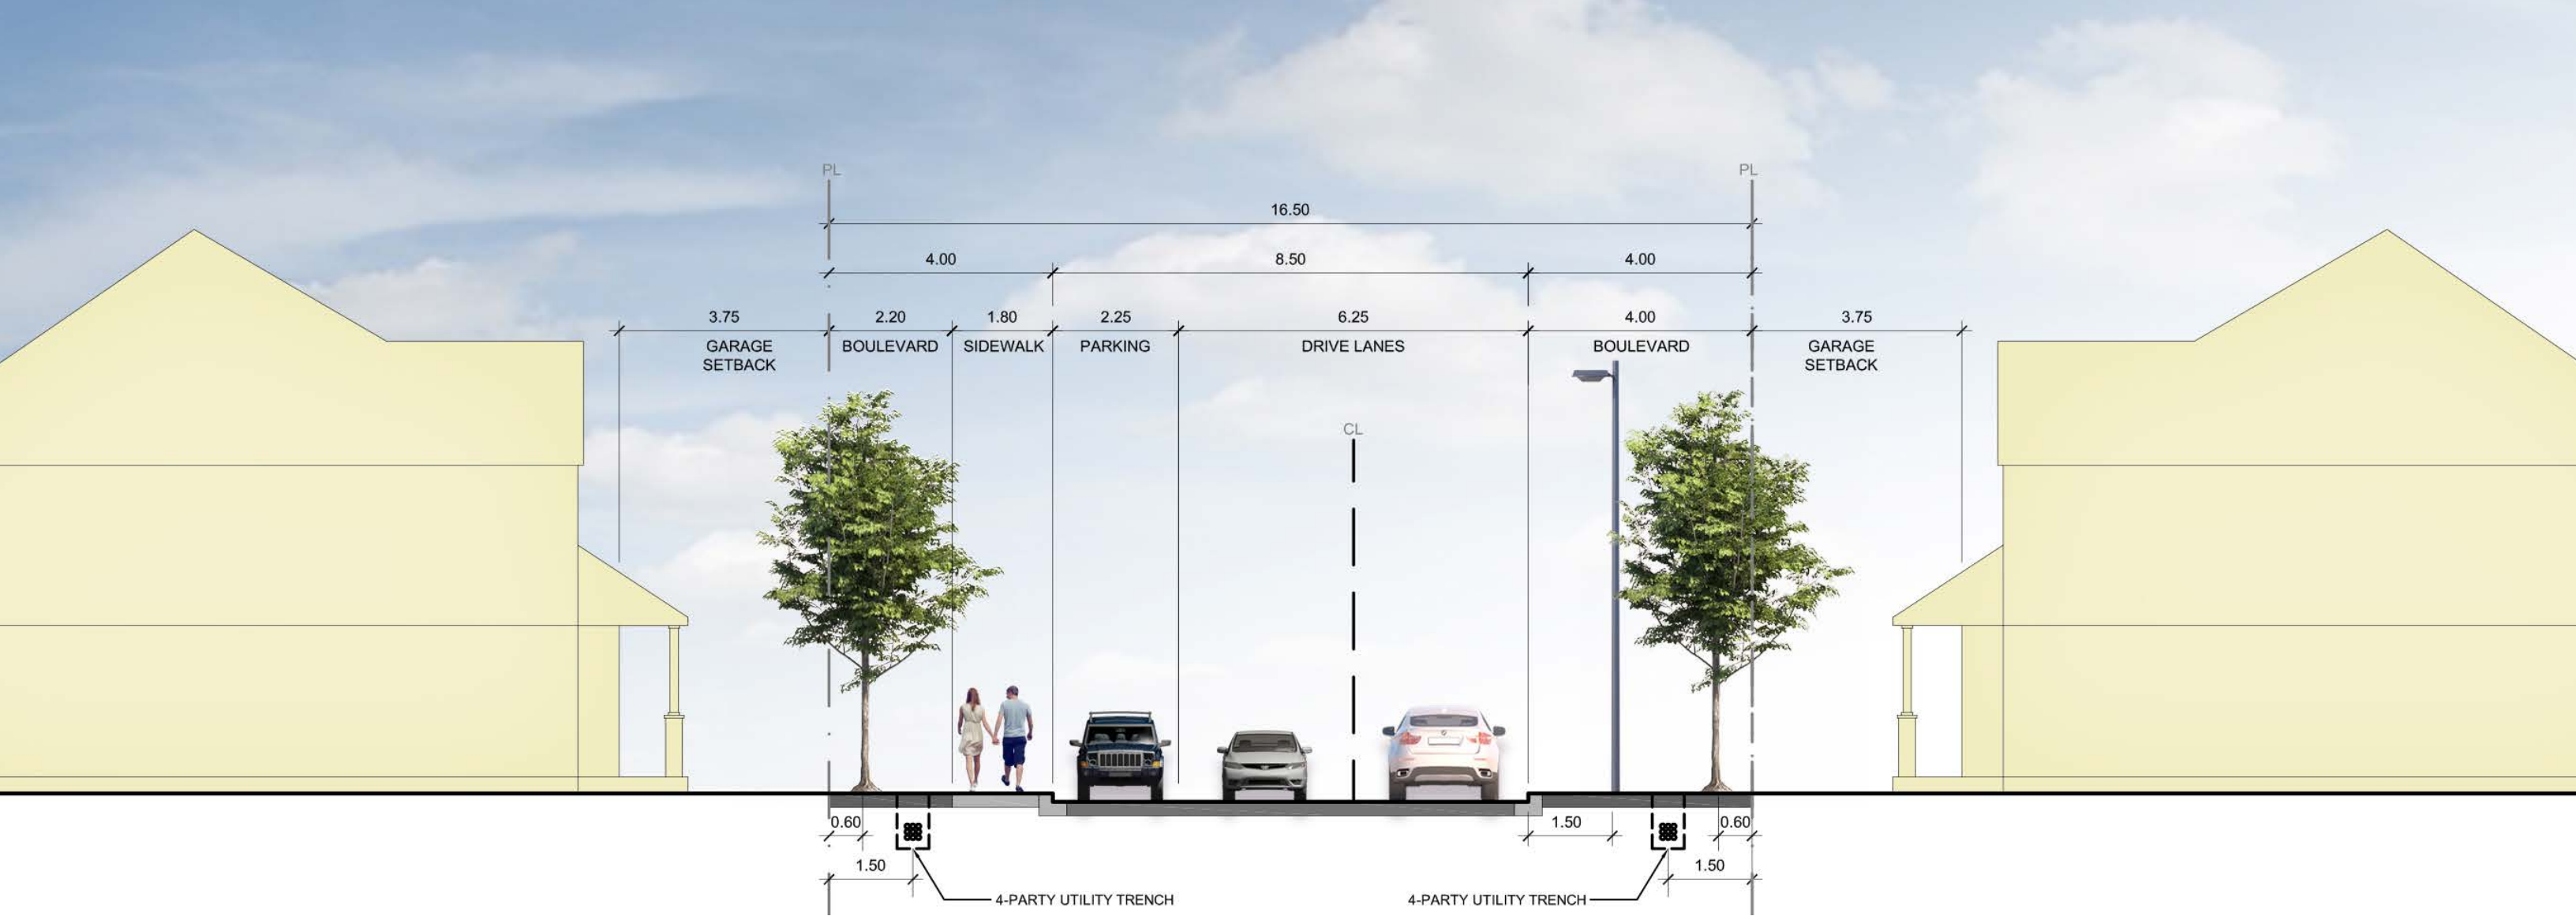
Local Road (Typical 16.5m Right-of-Way) Cross Section
